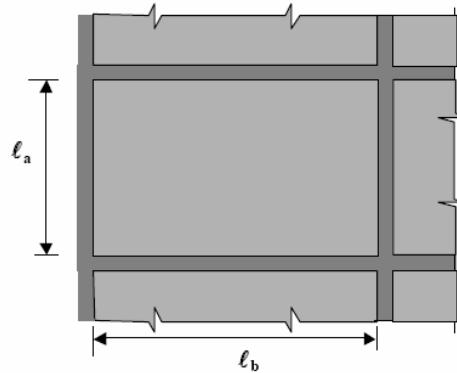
Edge panel with ℓ_a parallel to edge, of two-way slabs supported on girders, beams or walls
